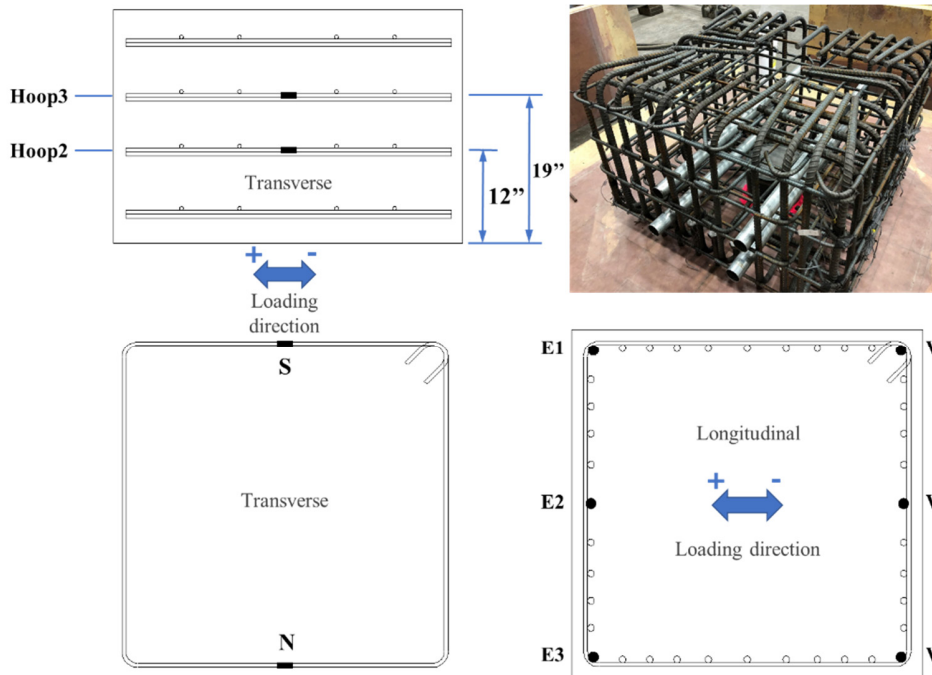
Strain gauges layout of the top block's longitudinal and transverse reinforcement.
